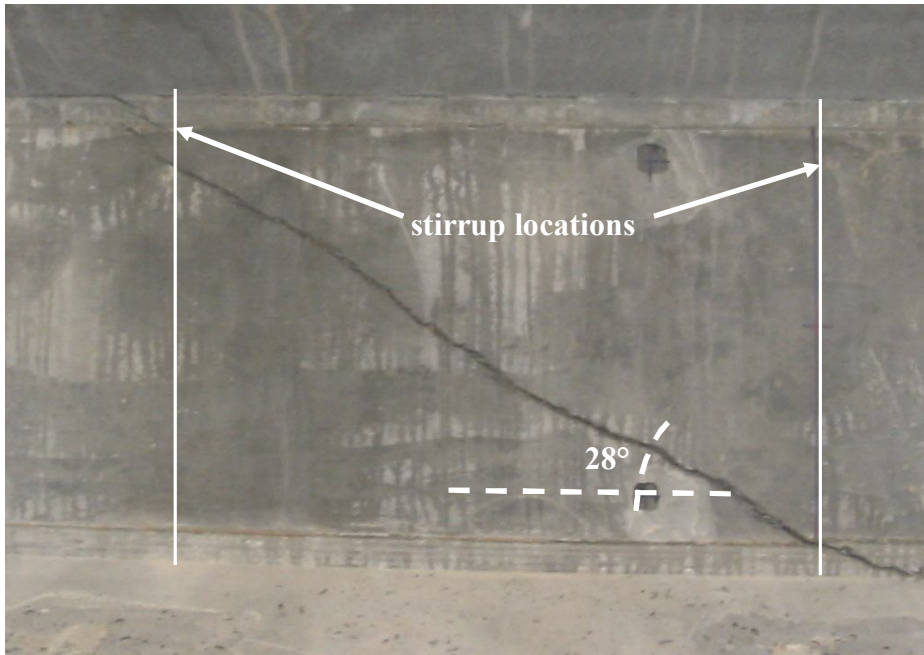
Diagonal tension shear failure of girder 2 during shear test 2-2.
